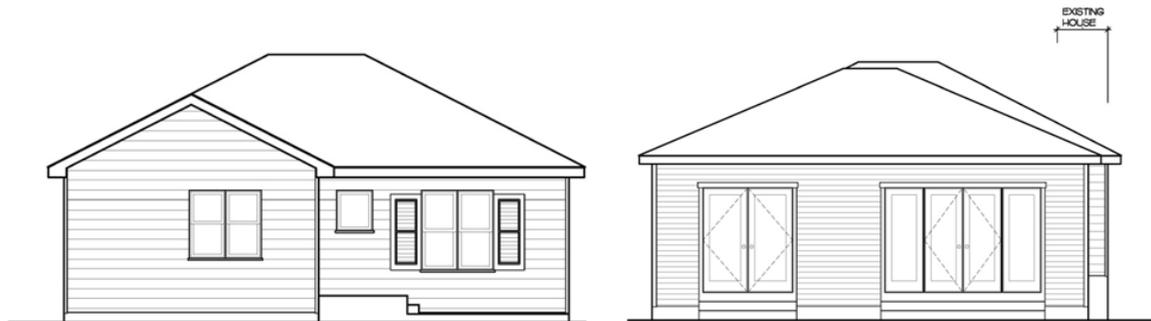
Existing(left) and Proposed (right) North Elevations (Rear).
